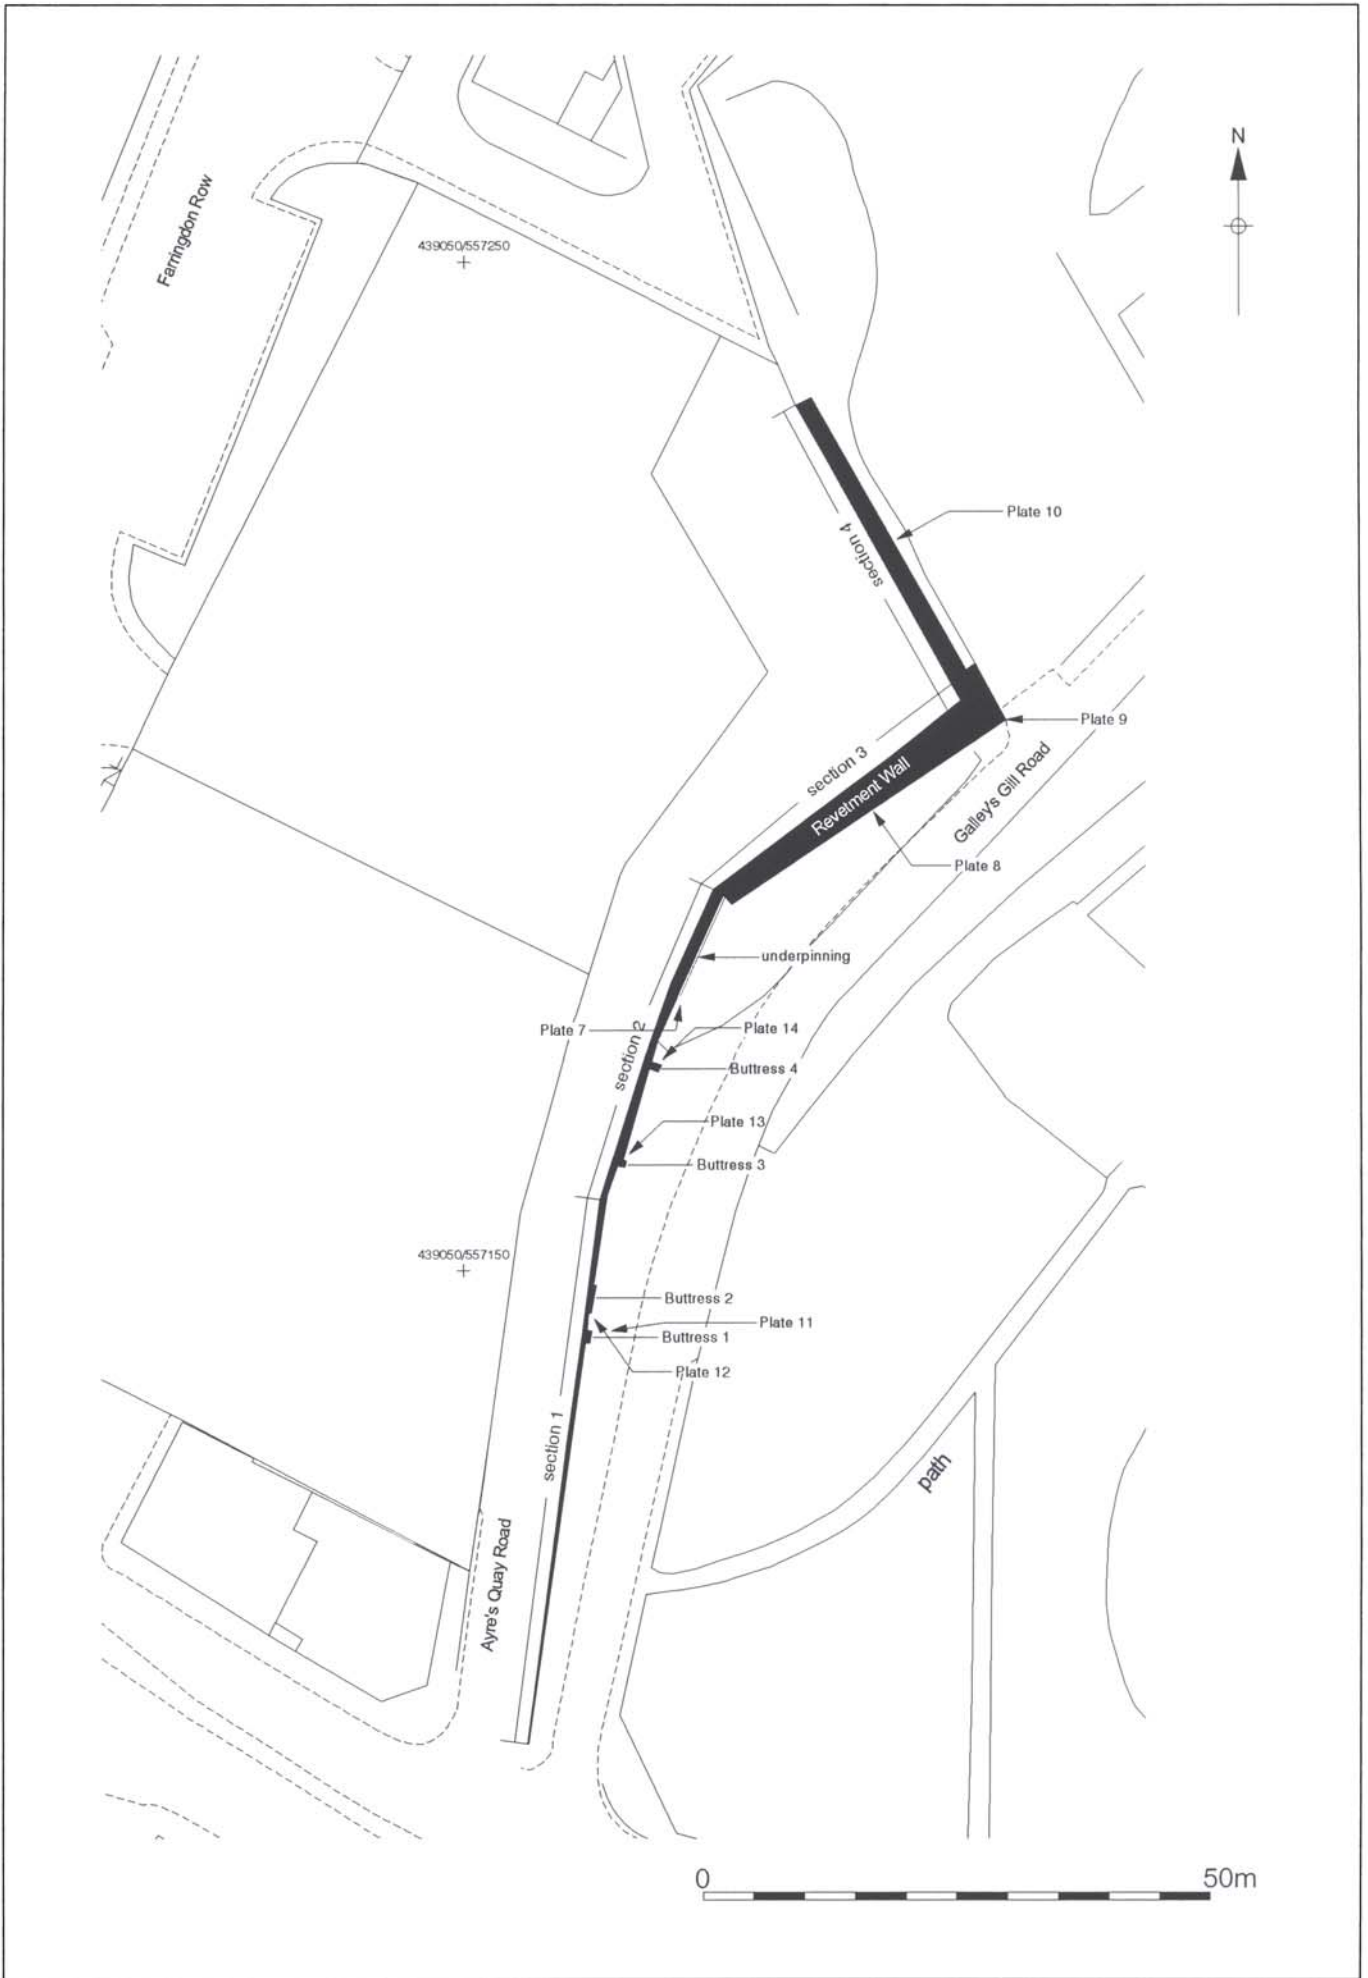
Detail of revetment wall (with locations of Plates 7-14)
